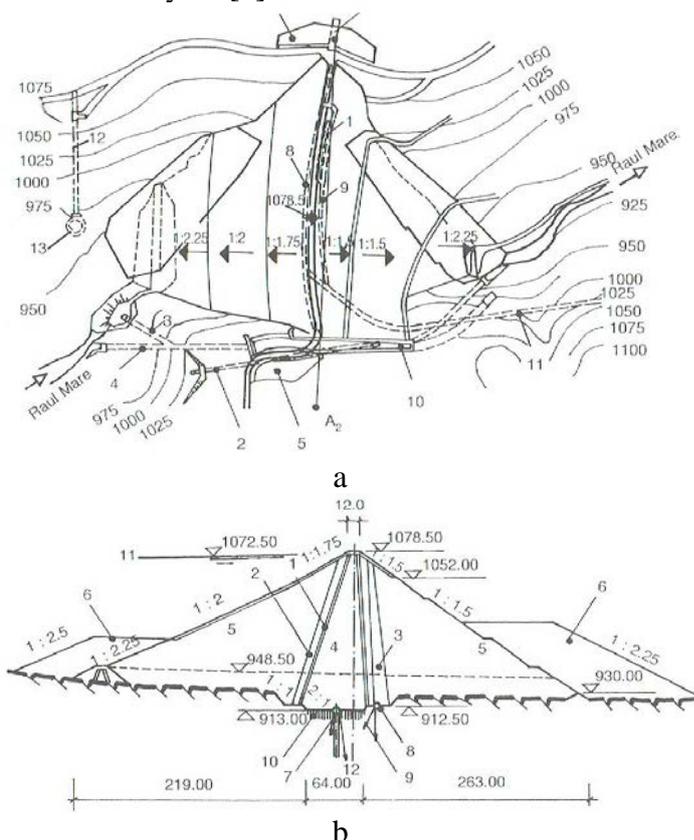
Characteristics of Gura Apelor Dam: a – plane view, b – cross-section; 1 – drainage gallery (elevation 996 m ASL); 2 – half-bottom outlet; 3 – bottom outlet; 4 – diversion gallery; 5 – right slope protection; 6 – left slope protection; 7 – grouting gallery (elevation 1078.5 m ASL); 8 – grouting gallery; 9 – collecting gallery; 10 – spillway; 11 – discharging gallery; 12 – headrace gallery; 13 – water intake;
